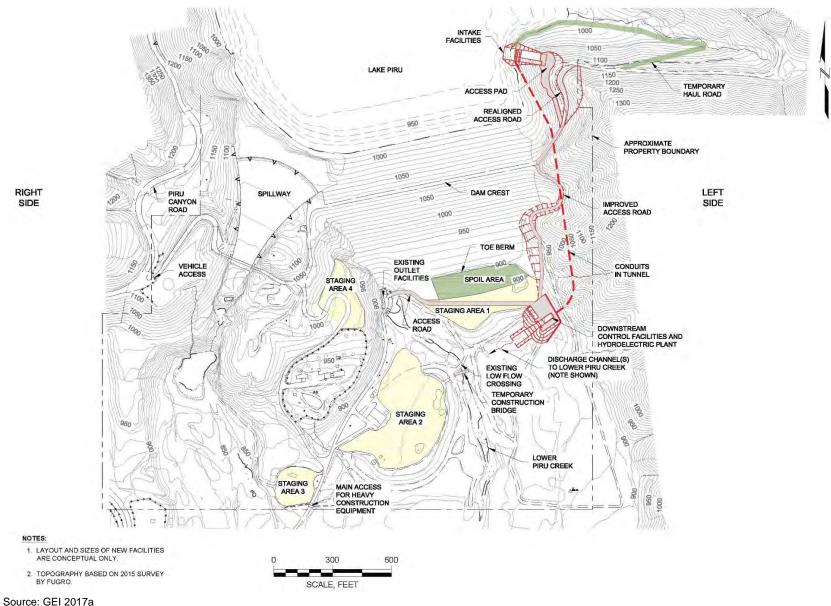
Outlet Works System Layout and Construction Footprint
